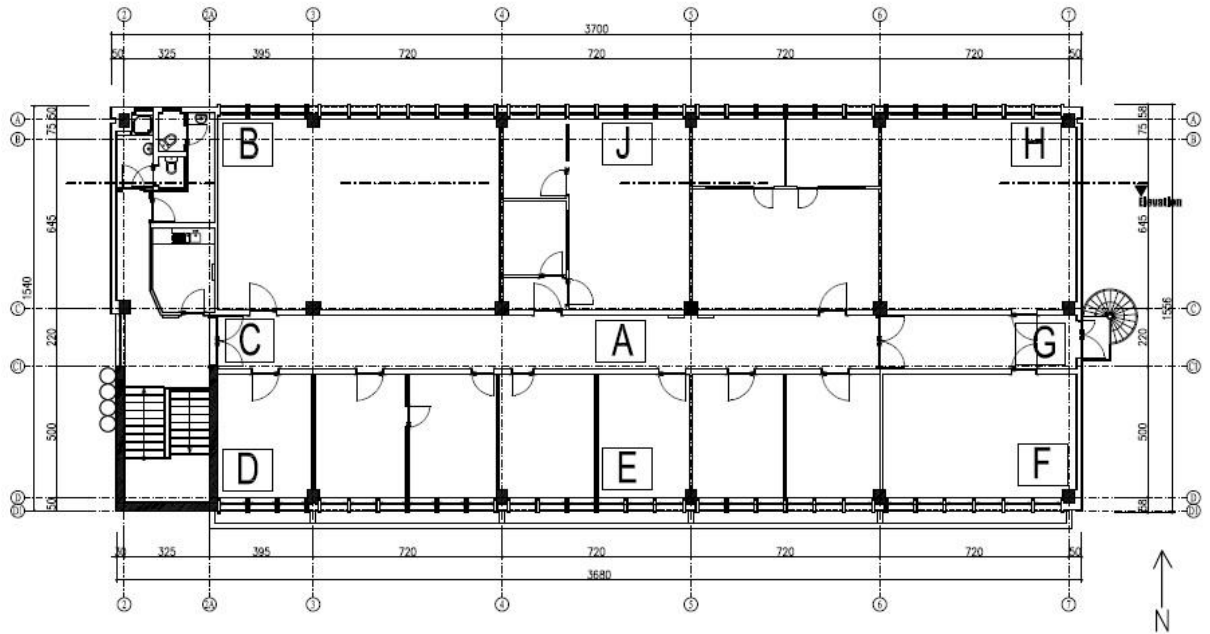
Instrumentation Plan of the Building on a Typical Floor.
